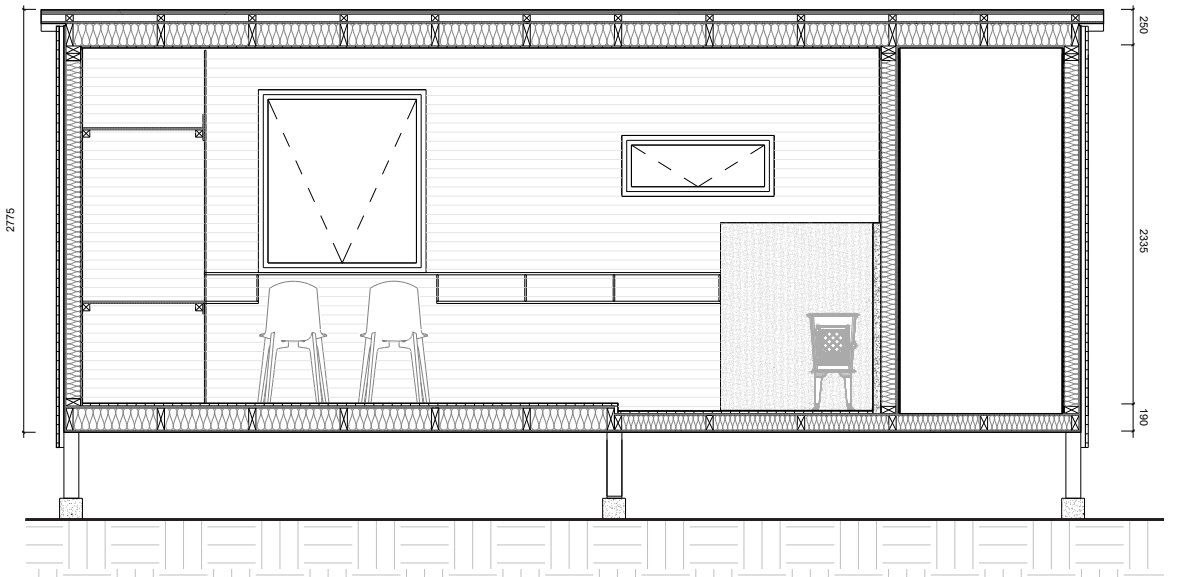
SECTION B-B OF THE BUILT CABIN. SCALE 1:50
